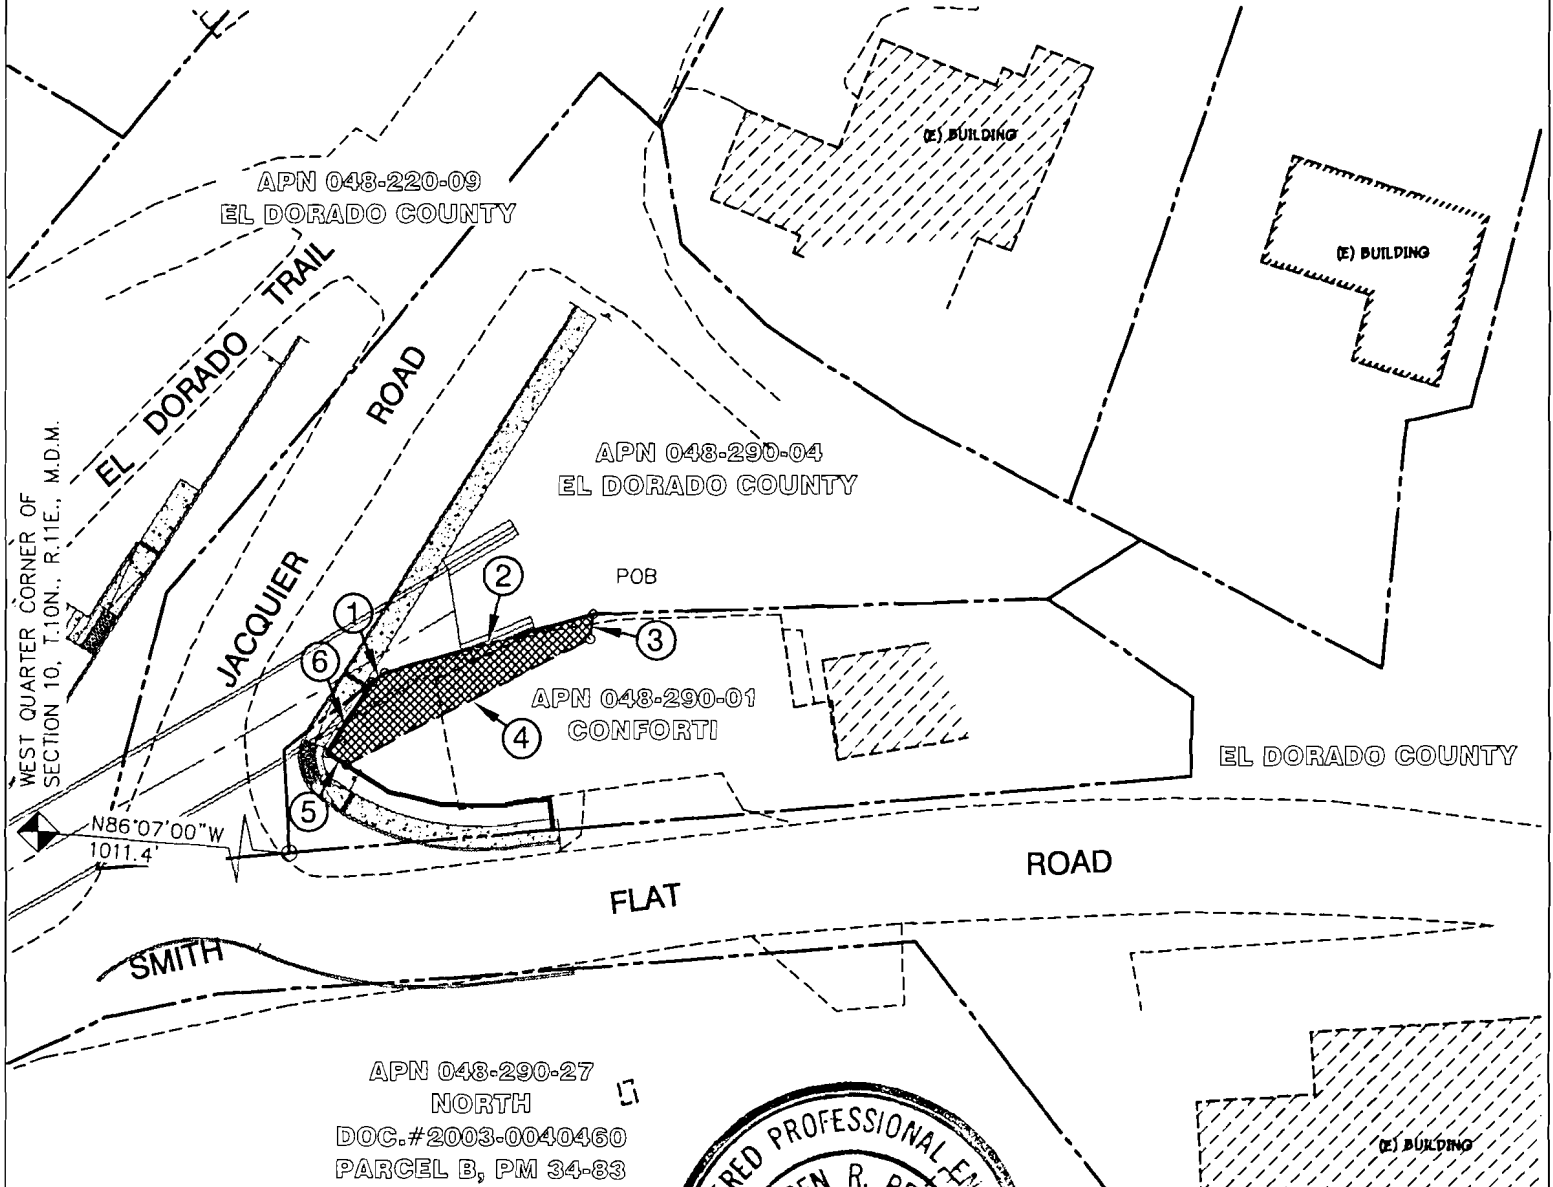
# EXHIBIT B PUBLIC UTILITY, SLOPE, AND DRAINAGE EASEMENT
